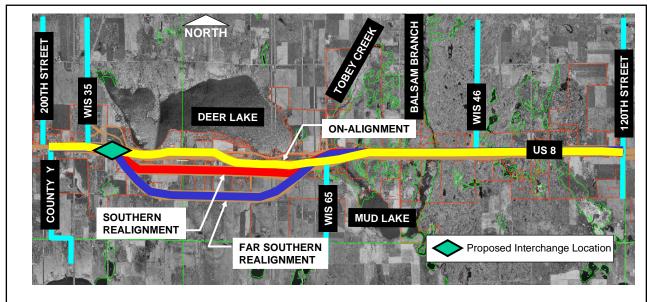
Segment I-200th Street to 120th Street
